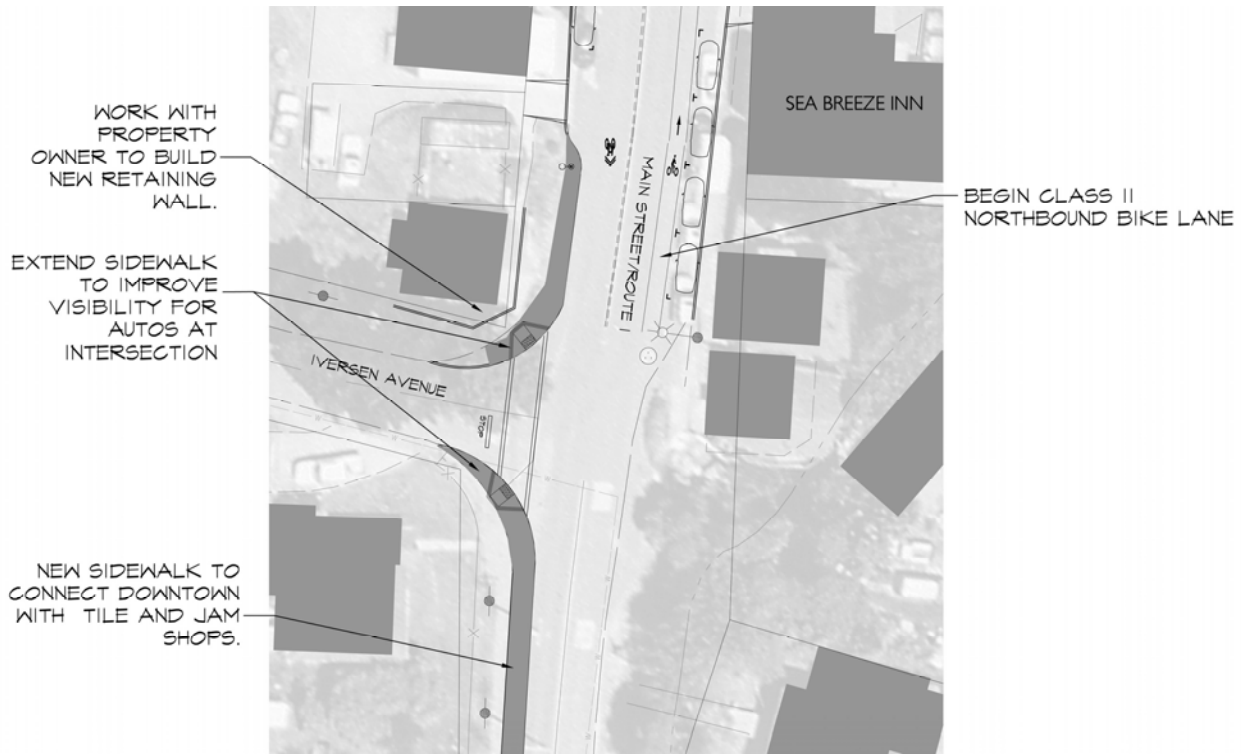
Proposed Pedestrian Improvements at the Intersection of Route 1 and Iversen Avenue
